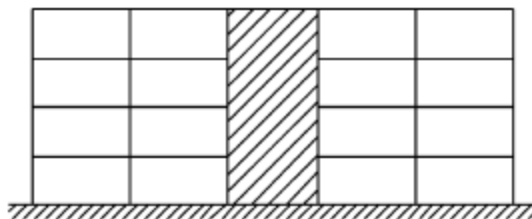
Structures with Concrete Cores or Concrete Walls
